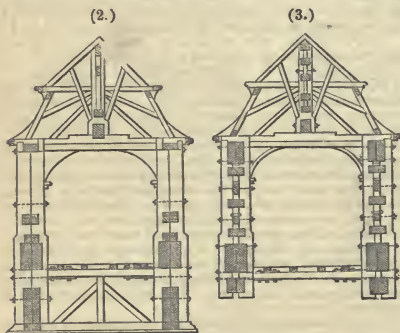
is a section at the centre. It will be apparent from these figures that this bridge is composed of a platform for the roadway, two side frames of carpentry, and a roof, so that it in fact constitutes a great hollow timber beam of a nearly rectangular form. These bridges were both burnt by the French in 1799, after having remained in constant use, the one for forty-two years and the other for twenty-one years. Armies, artillery, and heavy weights, had passed over them in safety, and they appear to have perfectly fulfilled the purpose for which they were designed. Each of the side frames was raised into its place in a piece by means of powerful screw jacks resting on piles.
